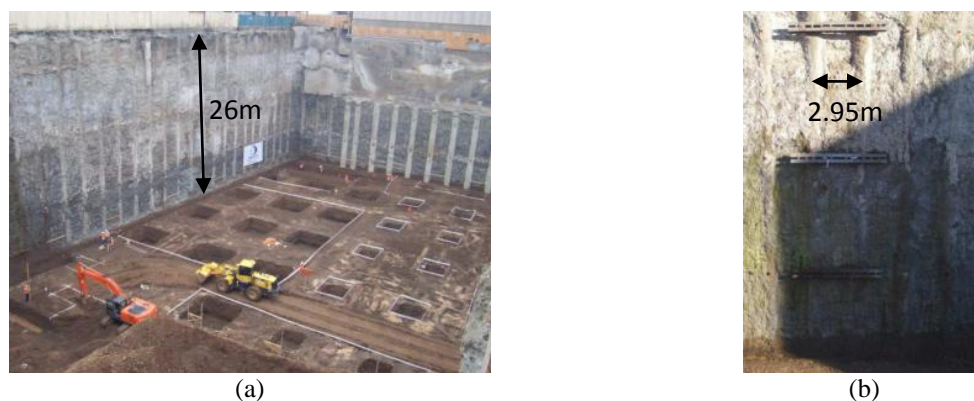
Typical excavation with non-secant anchored piling support, Beauchef building in Santiago, Chile (Tapia, 2011)
